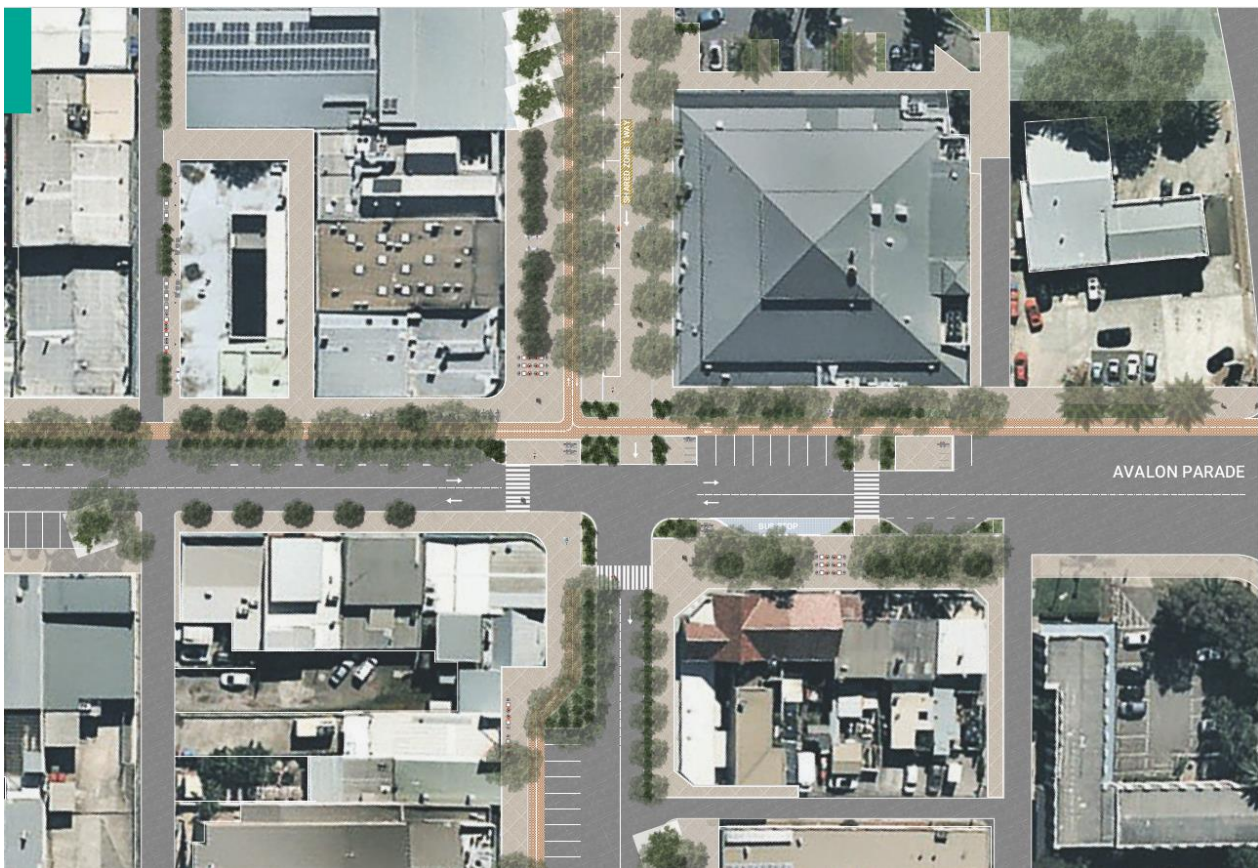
Old Barrenjoey Road Shared Zone 1 way
